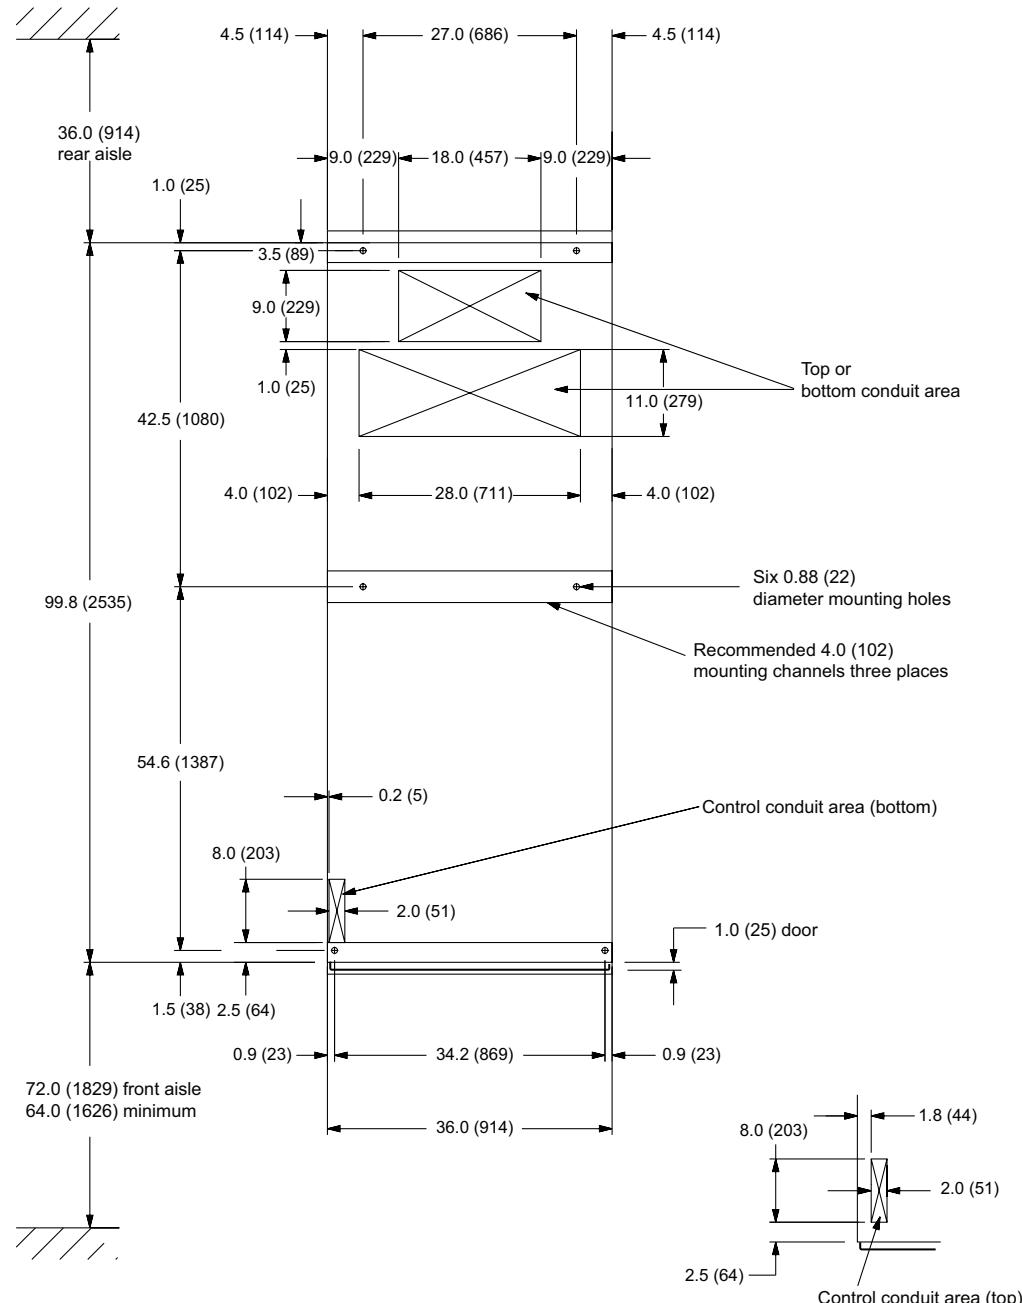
Floor Plan for Switchgear Rated Up to 50 kA
